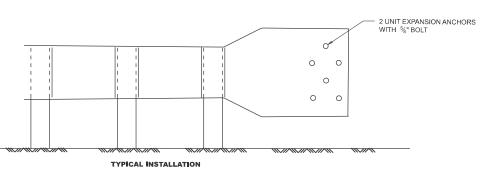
DETAIL OF CONNECTION OF GUARDRAIL TO SQUARE BRIDGE PIER OR FOUNDATION.
